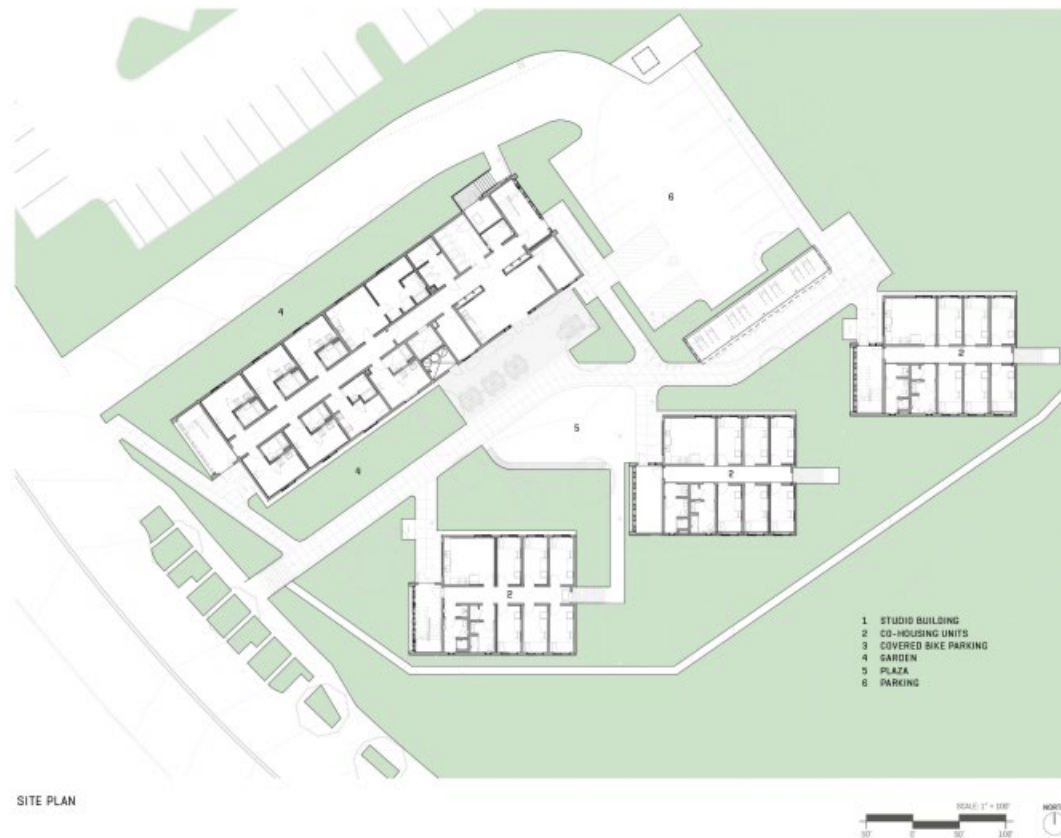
A site plan including floor plans of each residence in the Argyle Gardens complex. Credit: Holst Architecture
